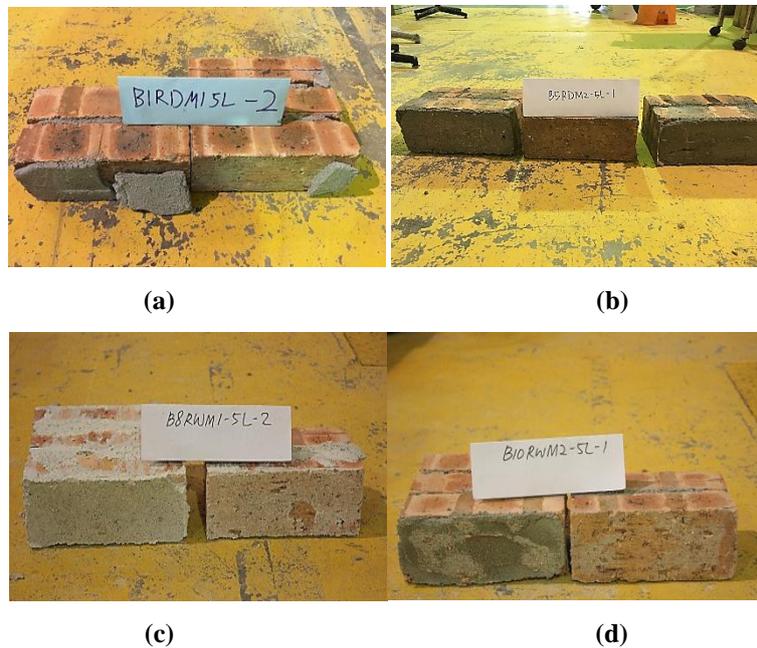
Failure mode for clay masonry under flexural bond test (a) RDM1, (b) RDM2, (c) RWM1, and (d) RWM2
